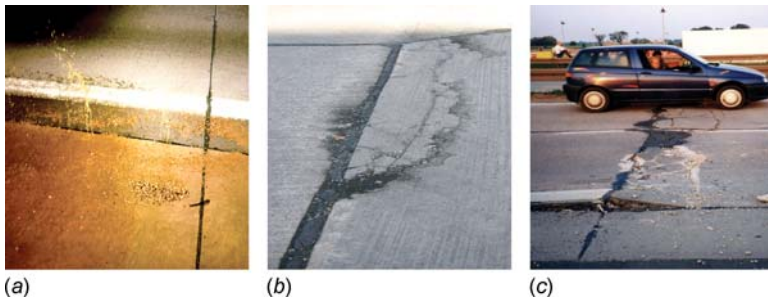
Typical pavement damages attributable to incapable joint sealing systems. (Left) Water shooting out of a pavement joint during traffic loading. (Middle) Flexural breaks. (Right) Slab blow up.
